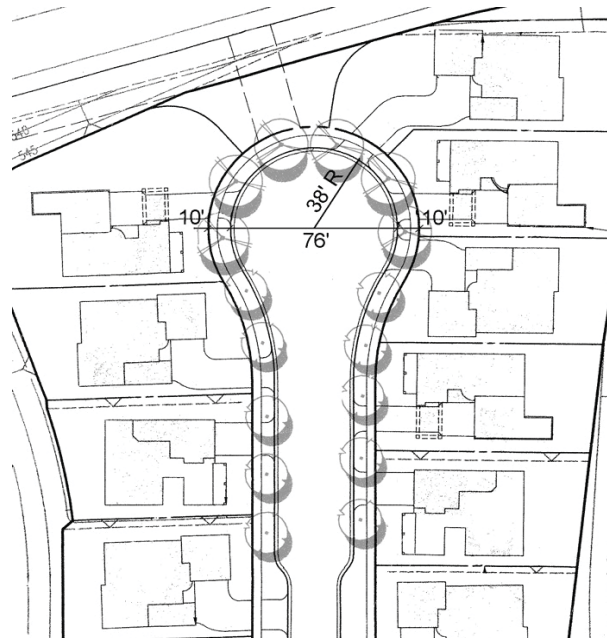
Typical Cul-de-sac with Curb Separated Sidewalk
